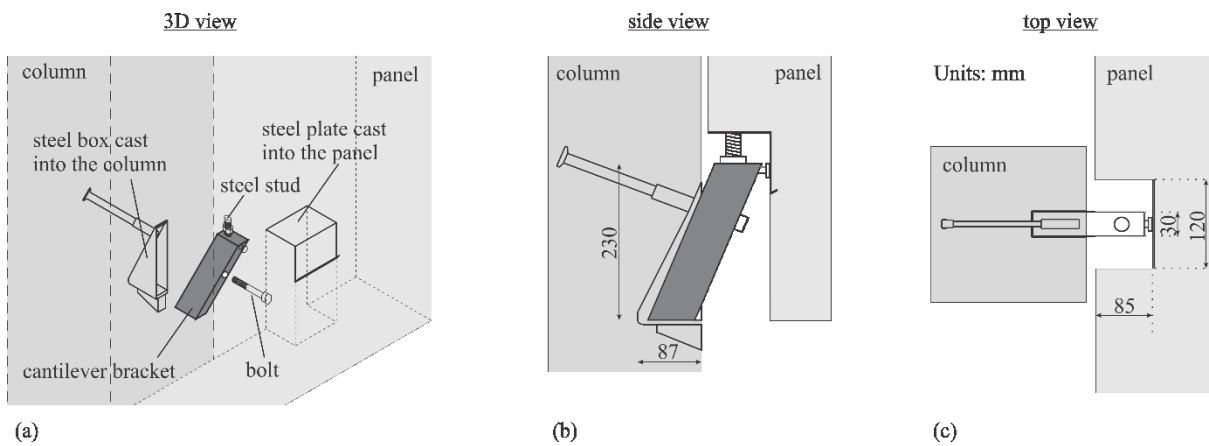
The assembly of the bottom cantilever connection: (a) 3D view, (b) side view and (c) top view
